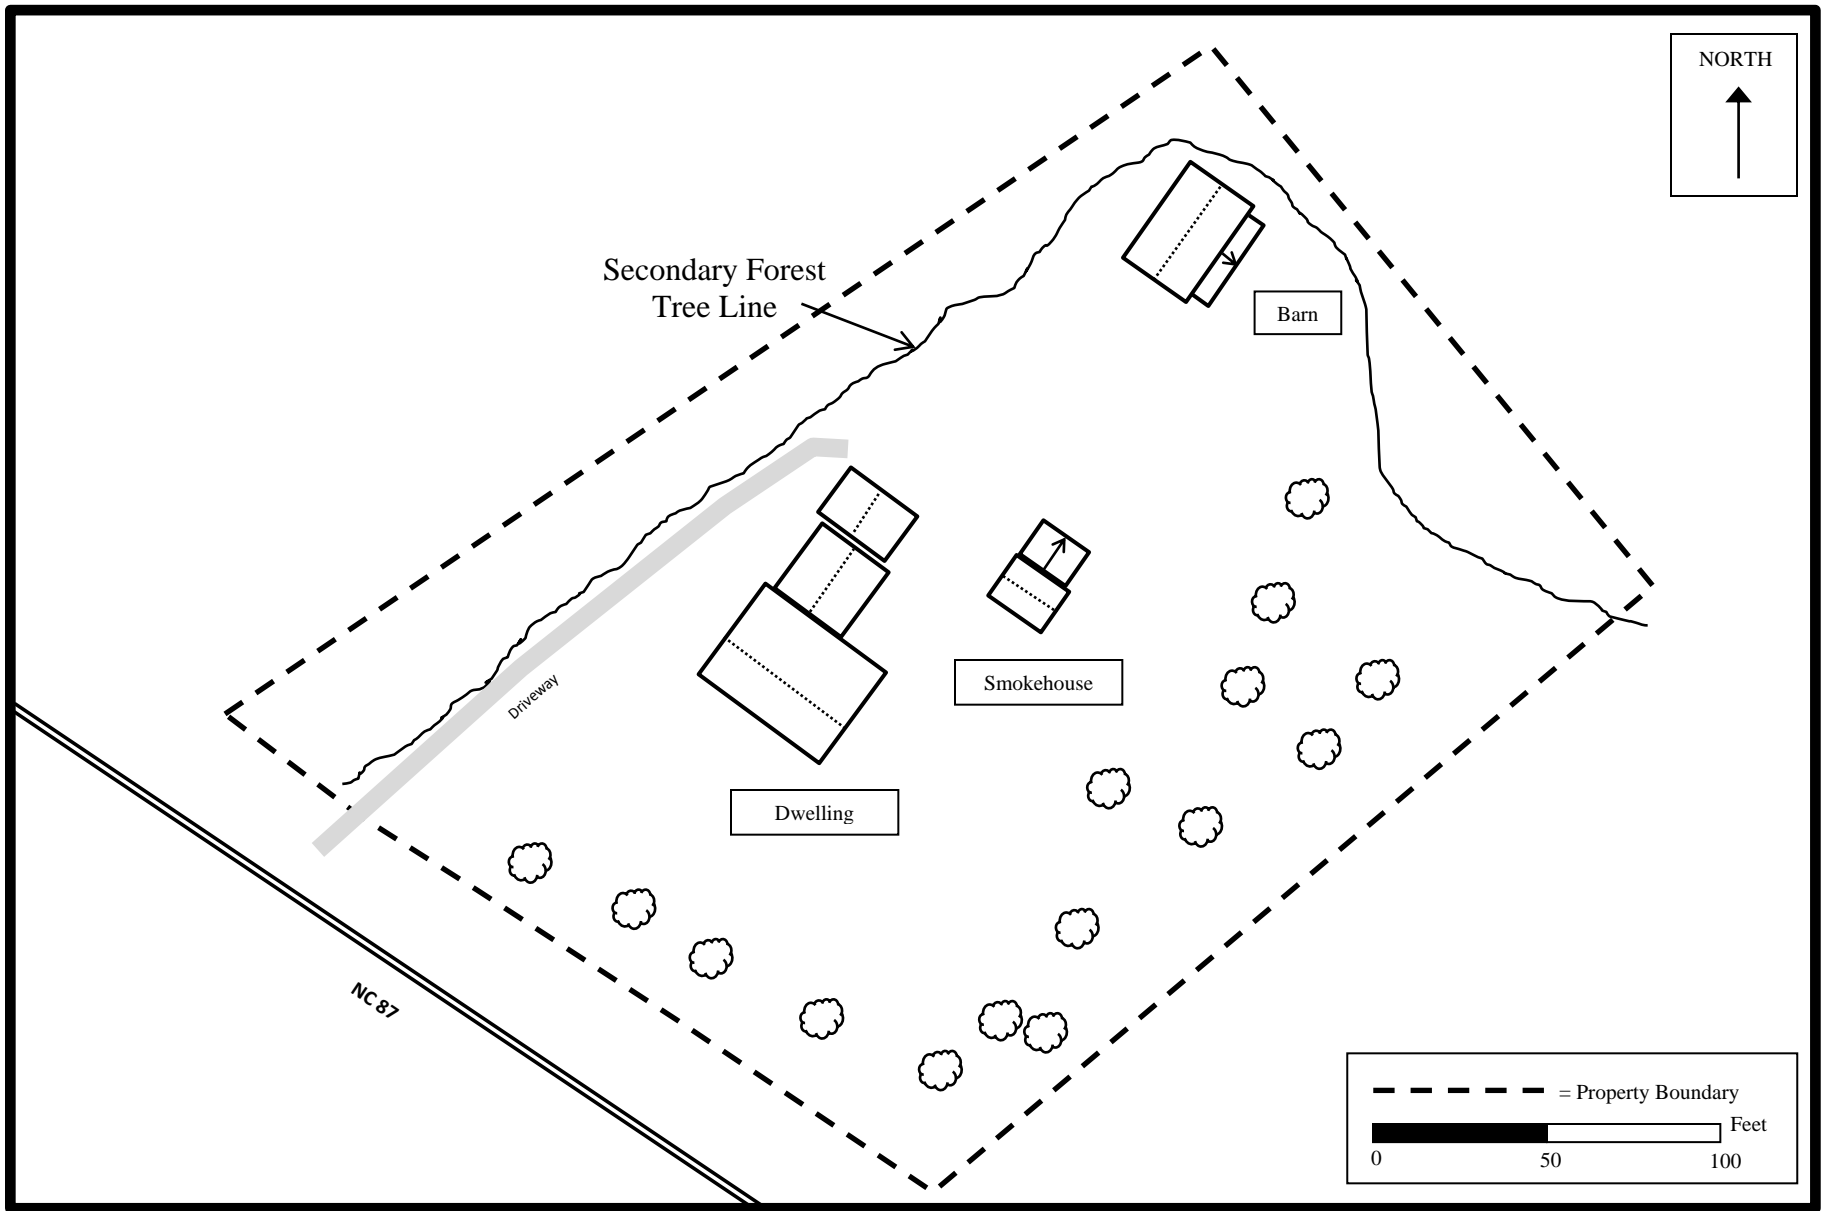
Site Plan Sketch of McDonald-Russ House (Resource 24).
